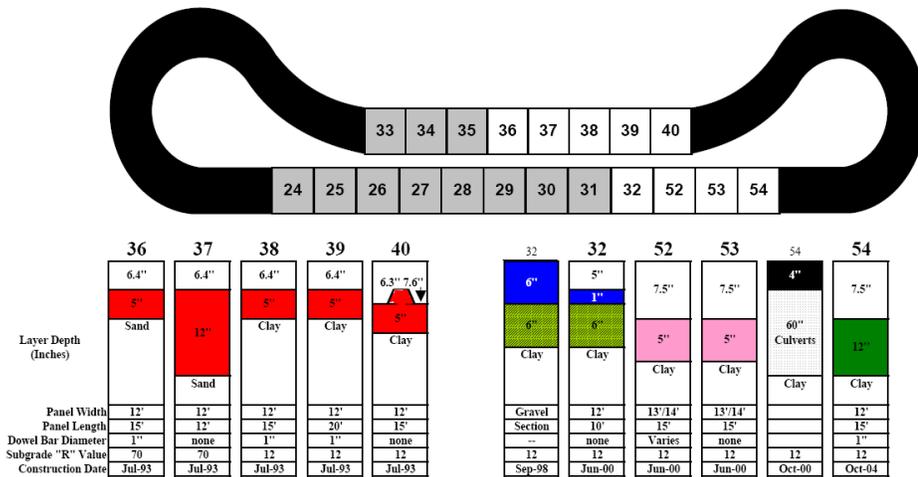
Mn ROADS Low Volume Road Concrete Test Sections
